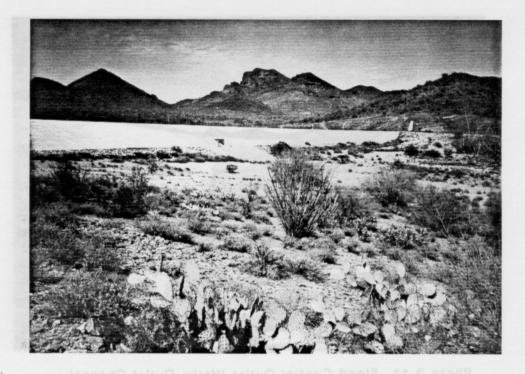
Upstream Slope of Spillway (view toward northeast).
